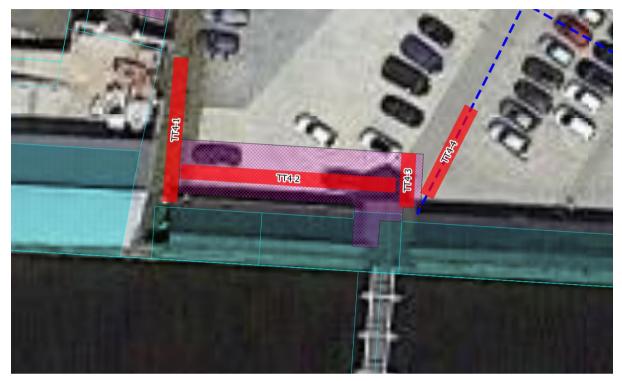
Proposed test trenches in Area 4 – TT4-1 to TT4-4.
